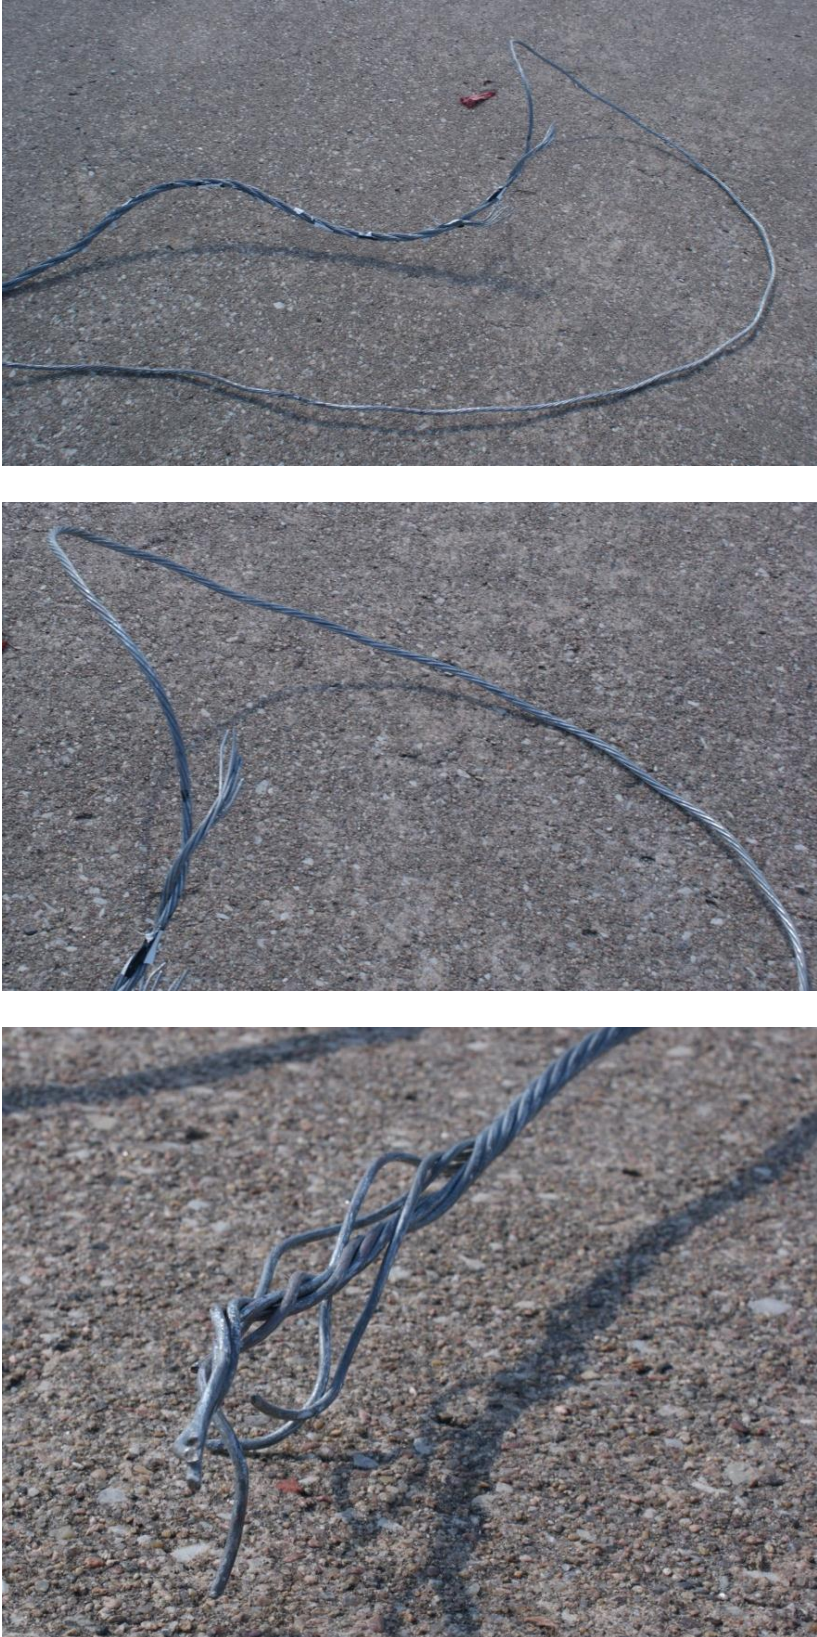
Downstream Wire Rope Damage, Test No. DTC-1
